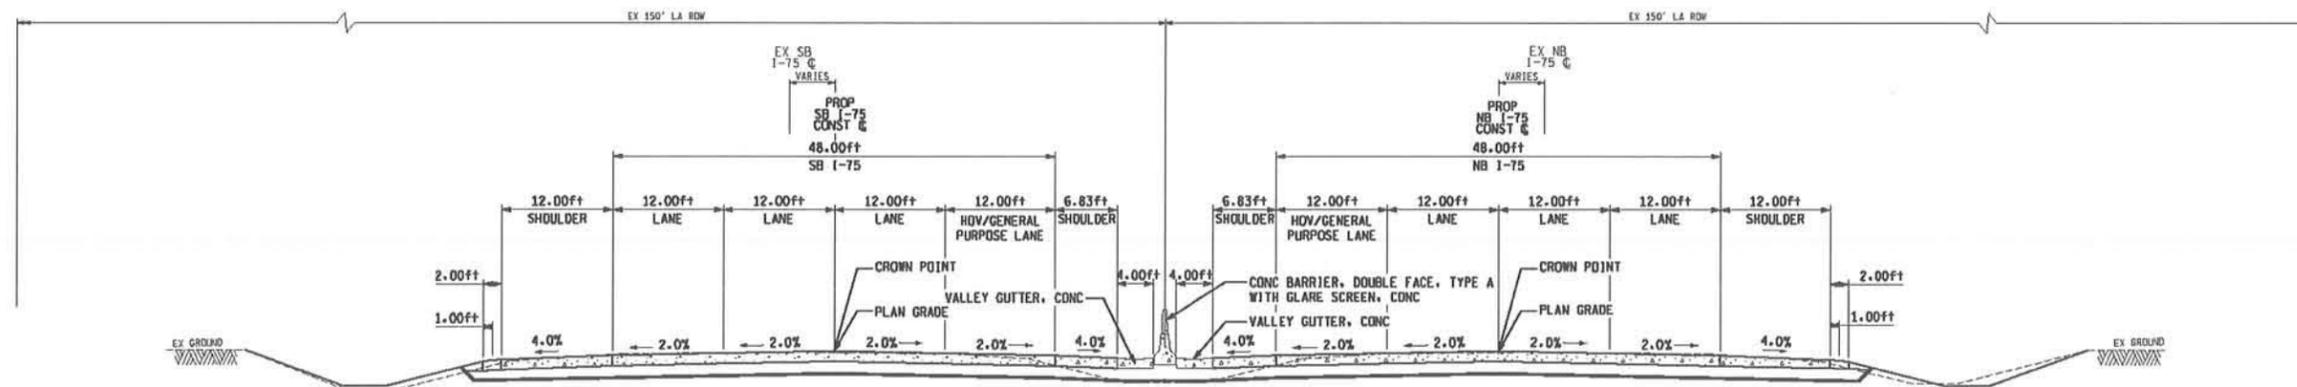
Proposed Normal Crown Typical Cross Section for I-75
